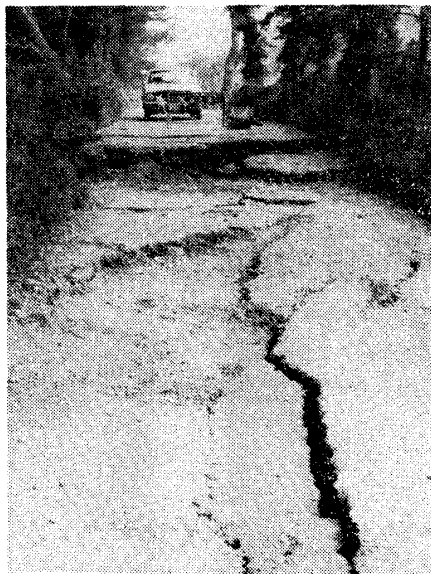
A subsided embankment along the Kitakami Canal (Site I-3)
